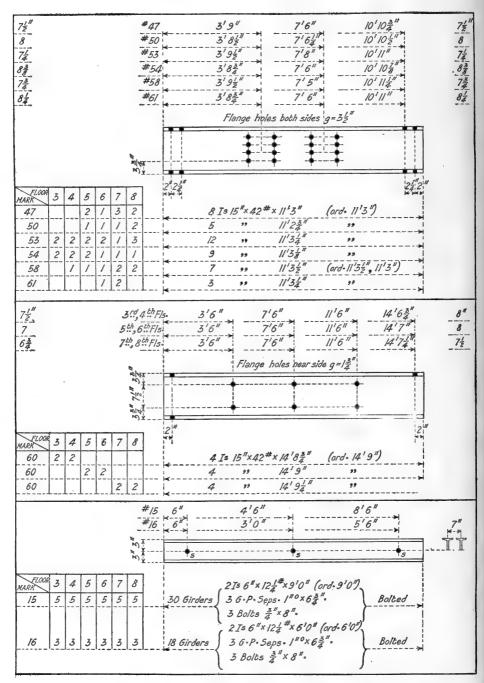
DETAILS OF FLOORBEAMS FOR A STEEL OFFICE BUILDING.
